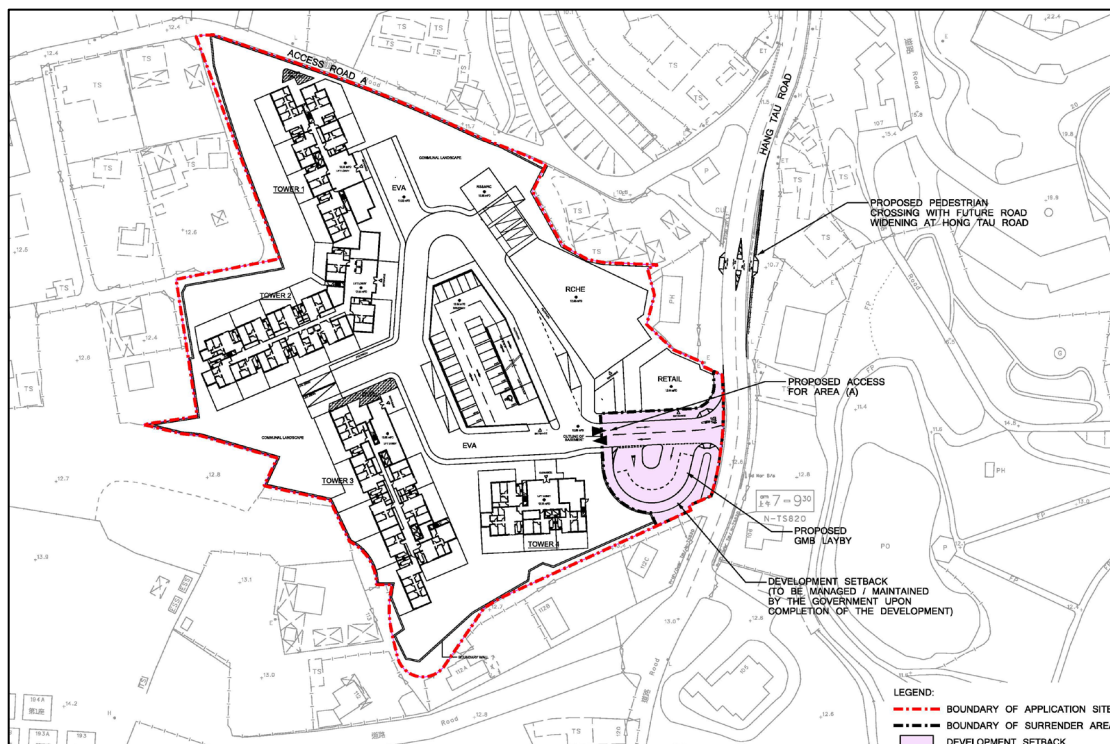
Proposed Traffic Arrangement under the Current Application
